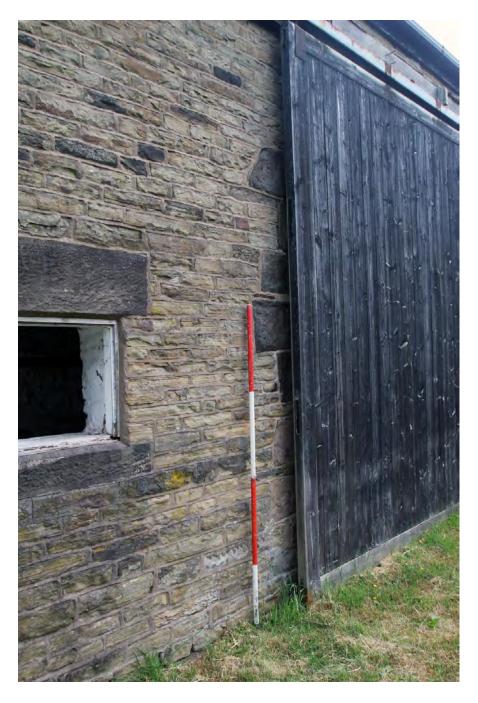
Doorway to drift house, in barn south elevation, viewed from south-west.
